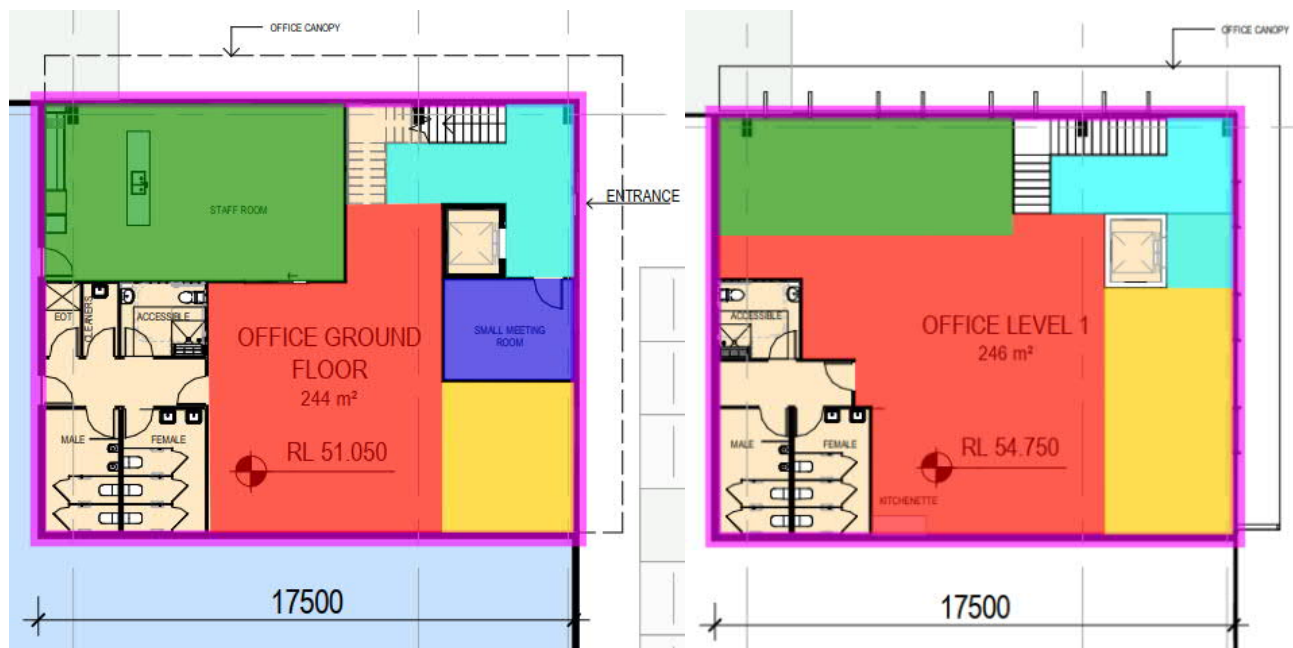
HVAC zones and thermal envelope for 1 Nursery Ave Ground Floor (Left) and First Floor (Right)
